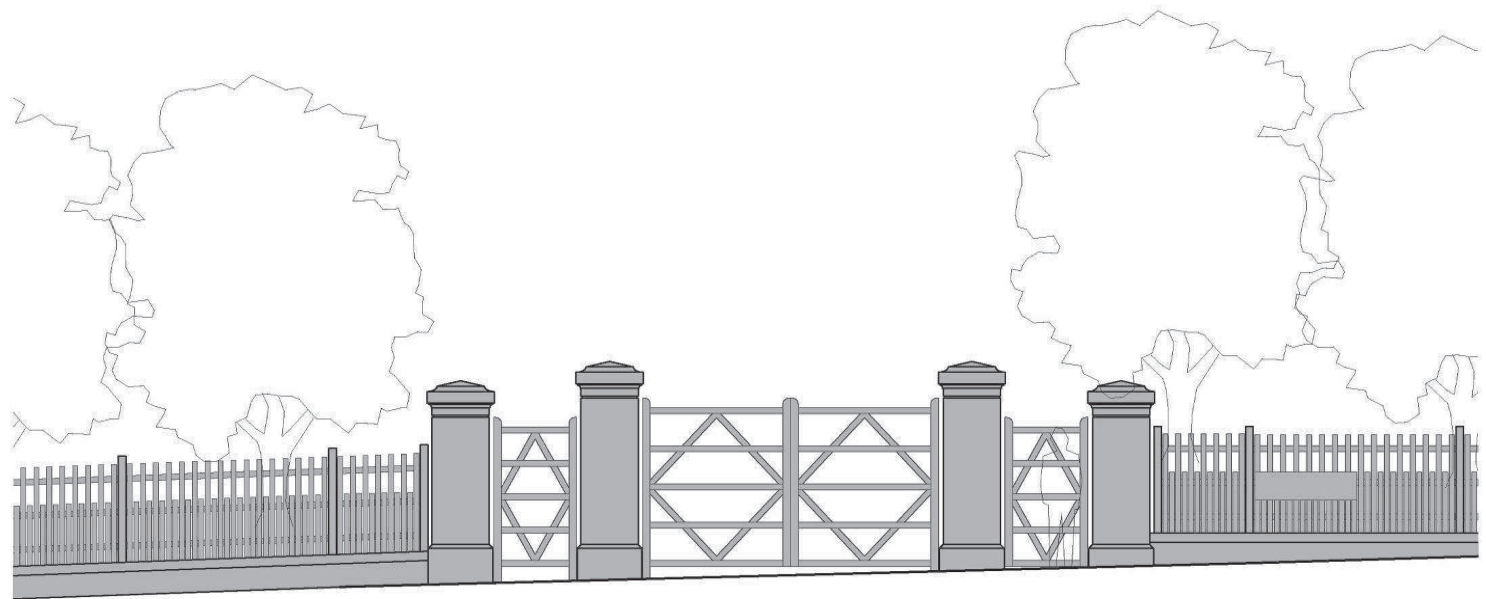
Architect's drawing of the proposed new gates and fence along Union Street frontage
